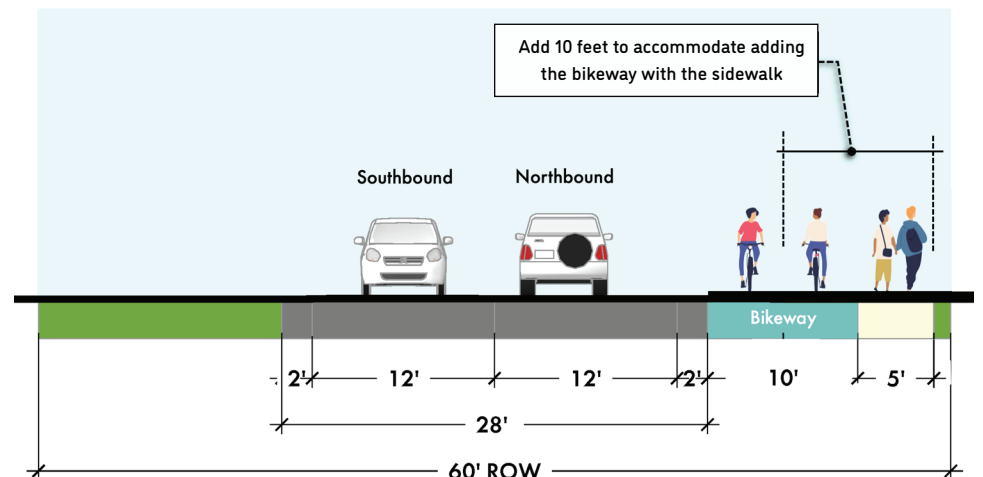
Proposed Section: Riverside Drive Multi-use Trail
